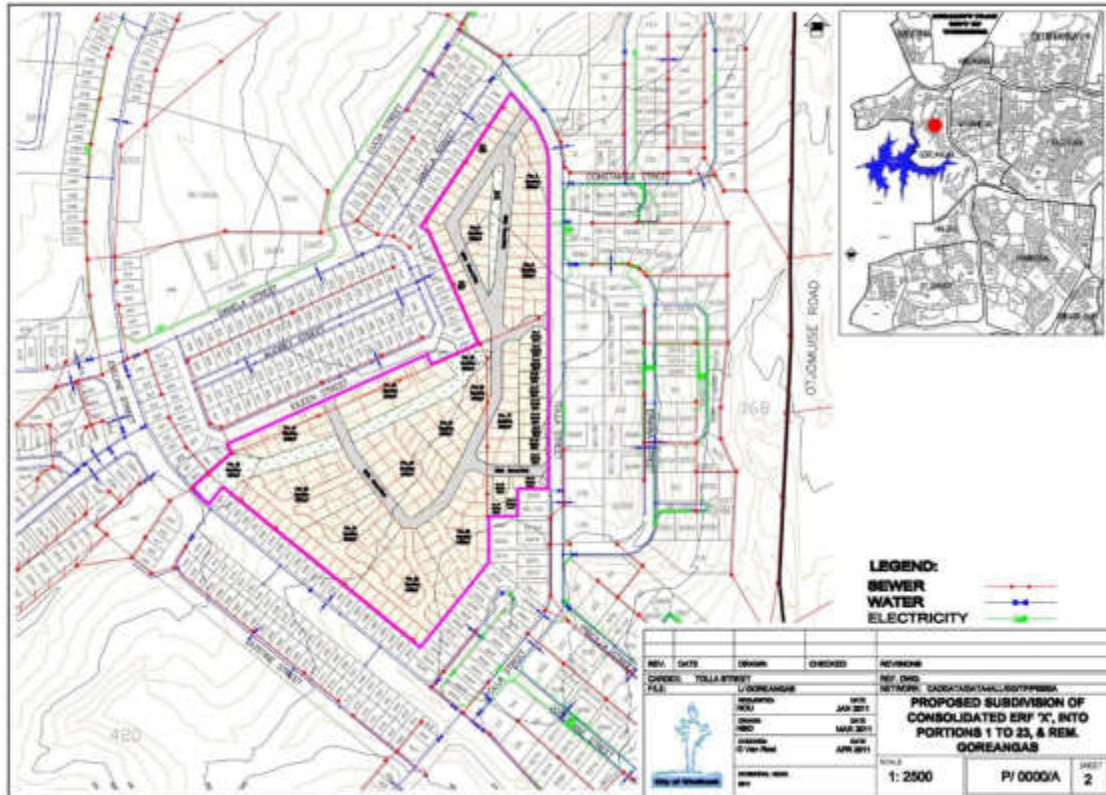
The proposed new layout of Greenwell Matongo D Informal Settlement.
